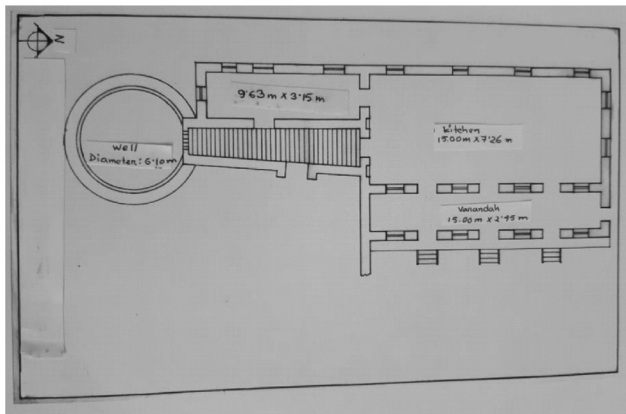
Plan and Section drawing of the Baoli at Fakir Chand Vaisnava Gosair Ashram
